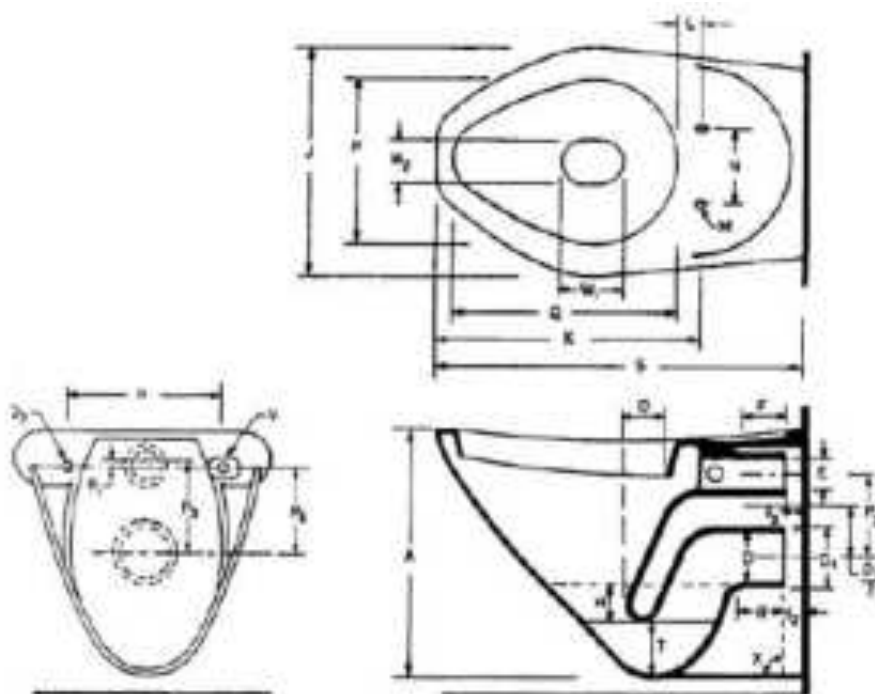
Typical illustration of Wall Mounted Water Closet with Concealed Outlet (Pattern 1)
